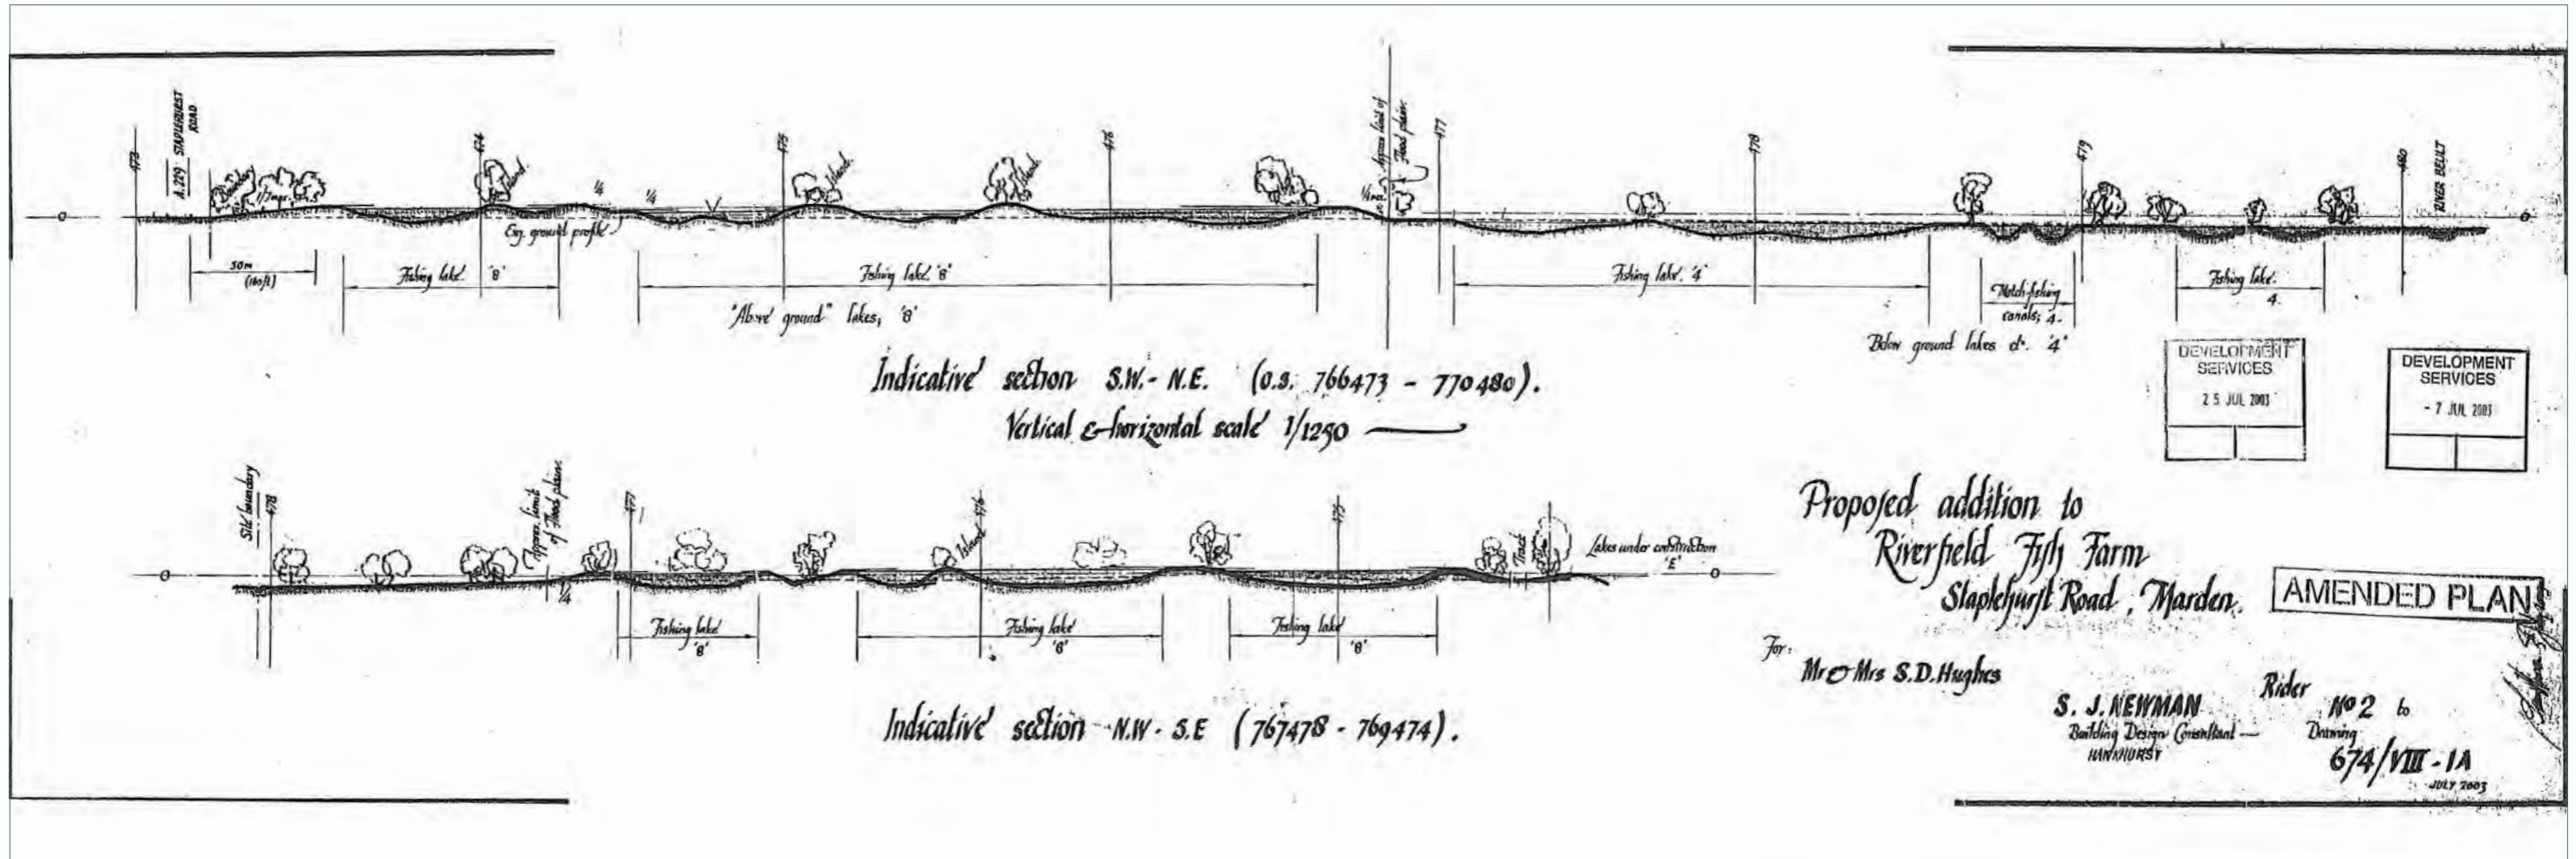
showing Proposed Sections (S J Newman 2003)
